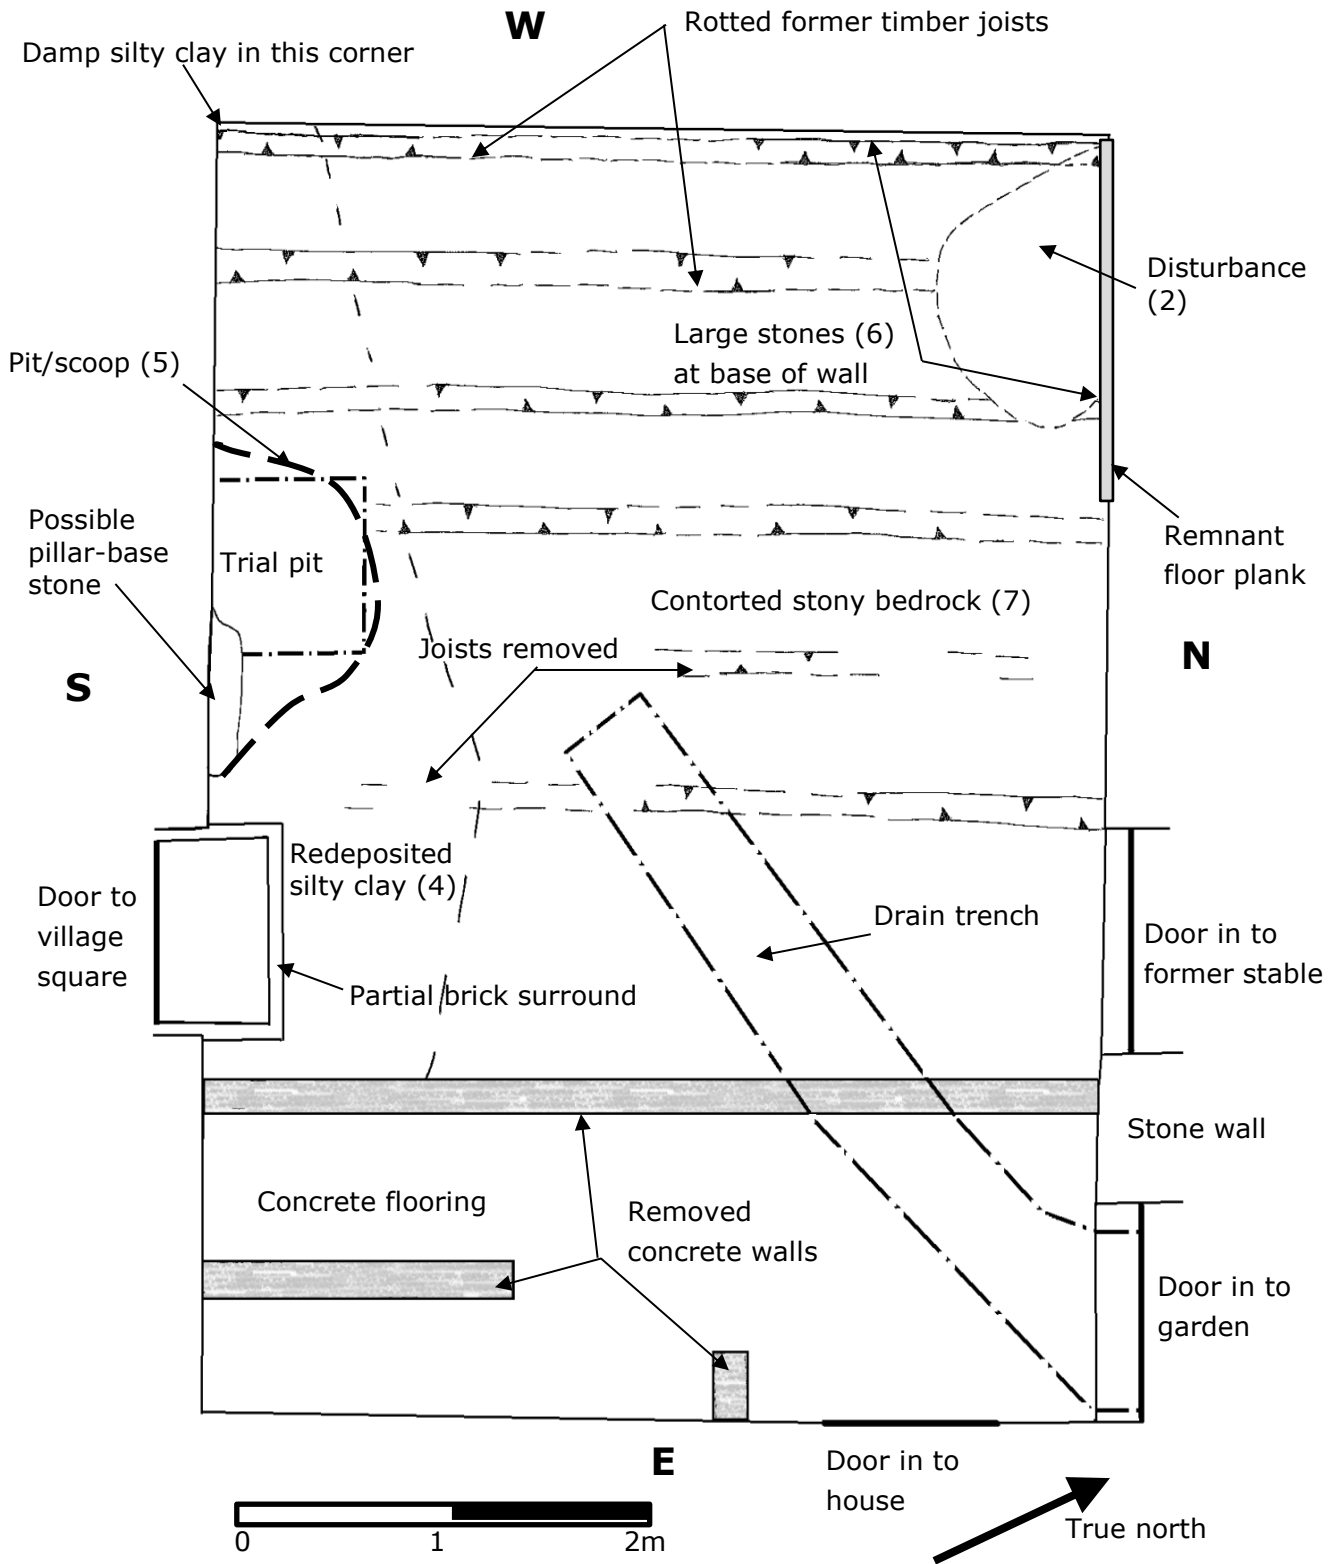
Annotated plan of the outhouse, showing the existent trial pit location, hand excavated foul water trench, all features uncovered following the removal of the compacted floor and other structural detail such as door positions and removed walling. The large N, E, S and W are referred to in the text for ease, although the true north is shown by arrow above.
